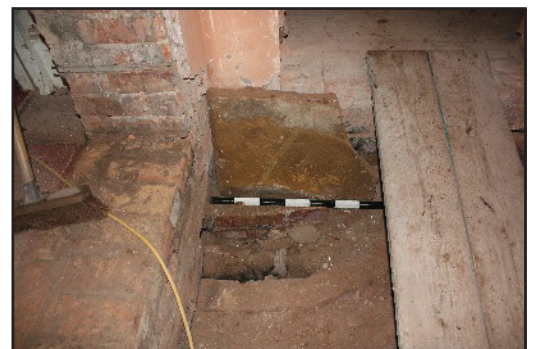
The well in the Kitchen, Epperstone Manor House, viewed looking south
